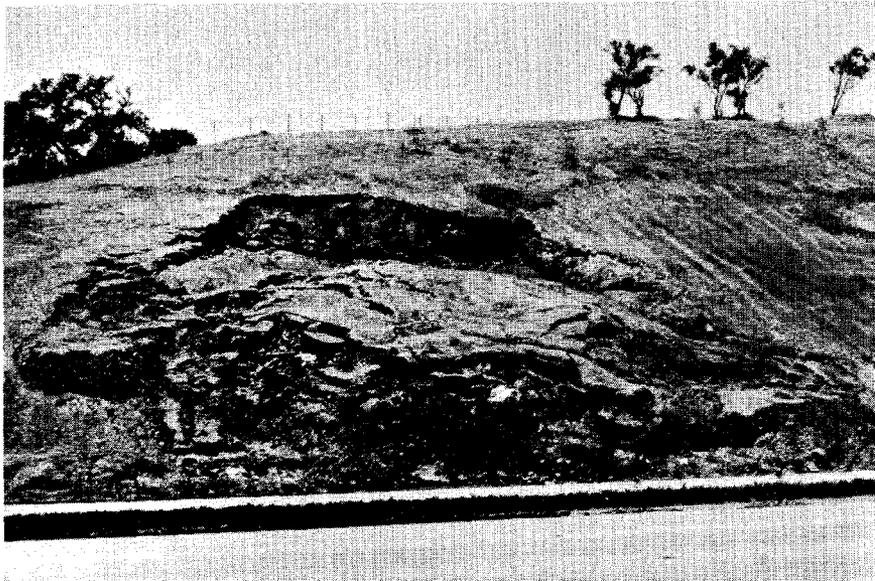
Photograph of Rotational Shear Failure Caused by Excavation for Highway (photo by Donald O. Doehring).
